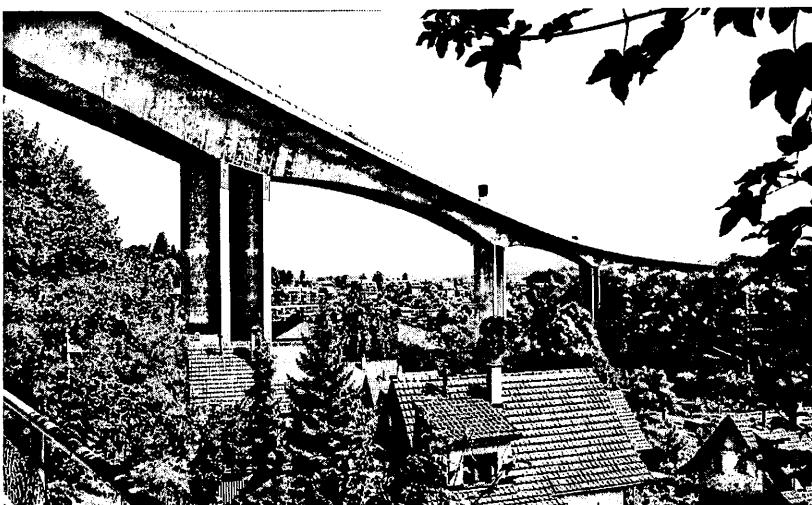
Felsenau Bridge, prestressed concrete hollow-box cantilever.
